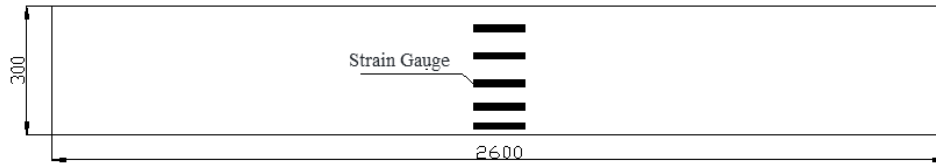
Layout diagram of concrete strain measurement points (Unit: mm)
